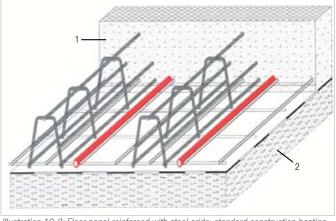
Floor panel reinforced with steel grids; standard construction heating pipes assembled to the lower reinforcement grid
